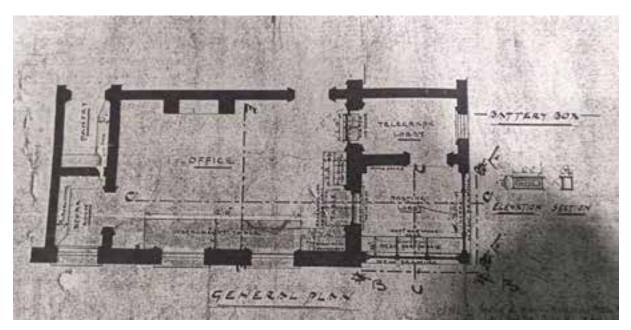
Floorplan dating to 1885 that showed that the original extent of the post office building, which excluded the verandah and the two projecting bays to the main elevations (built 1900) (Saleta 2016).
